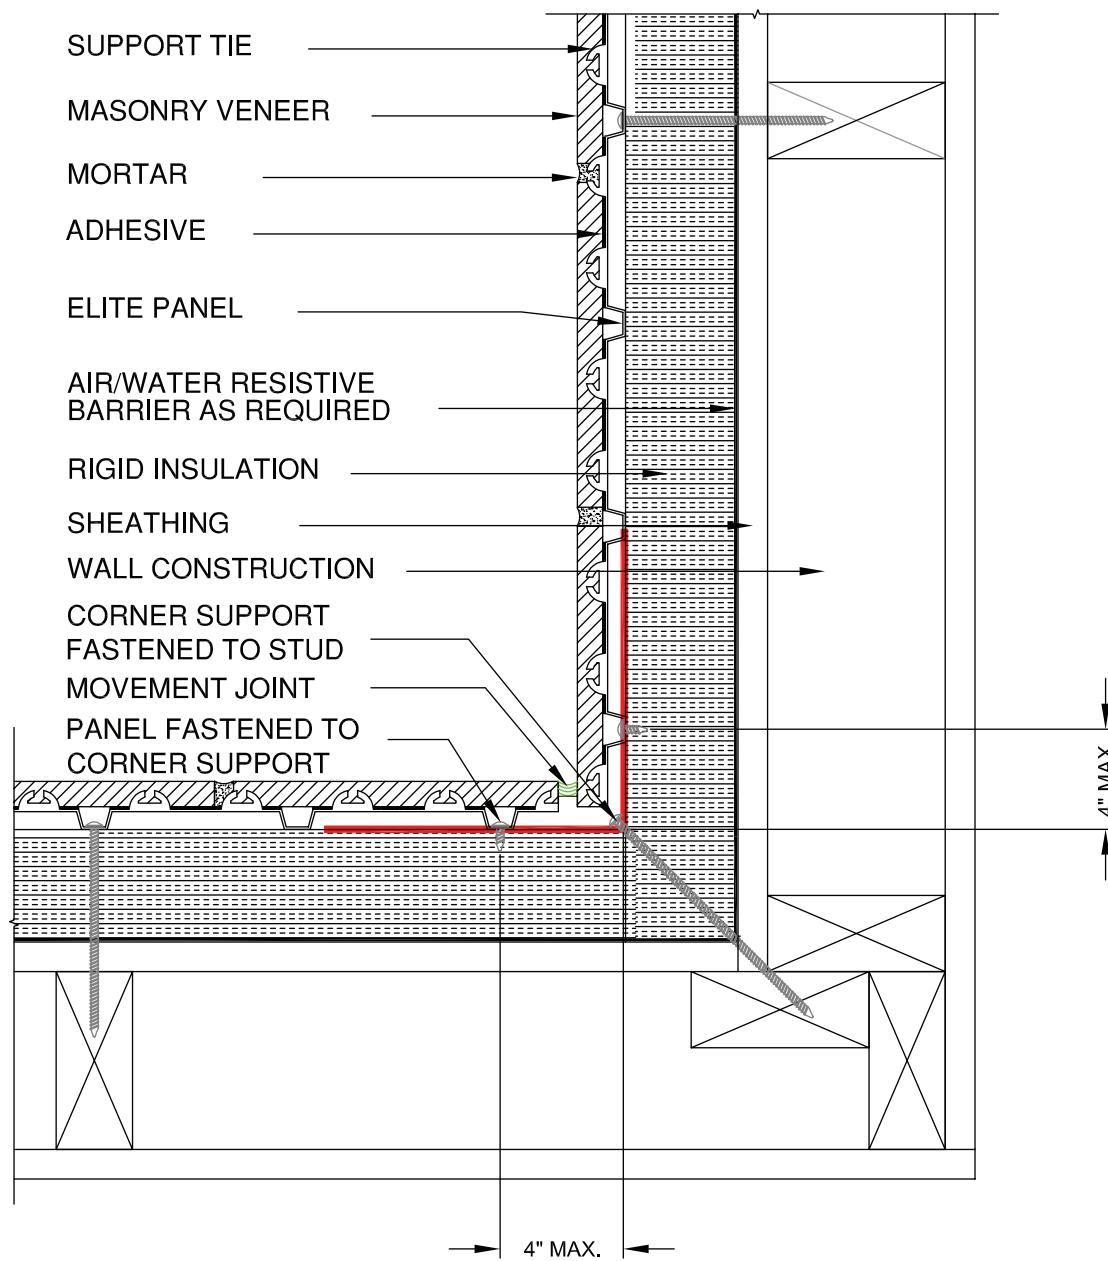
CORNER SUPPORT AT INSIDE CORNER WITH 2 IN. INSULATION
